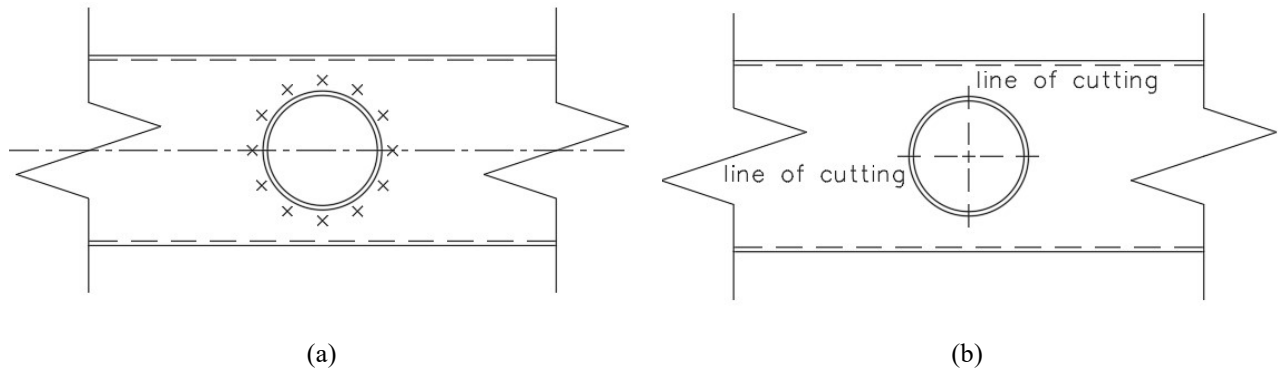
Location of (a) weld size measurement and (b) cutting after tests
